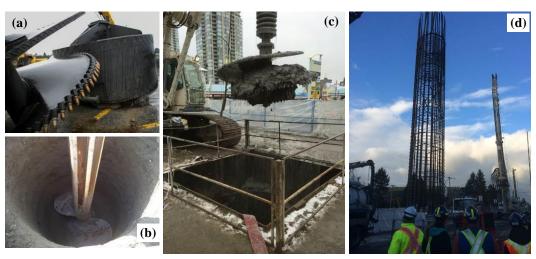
Drilled shafts: a) drilling and cleanout tools, b) dry drilling, c) drilling rig; and d) reinforcement cage.
